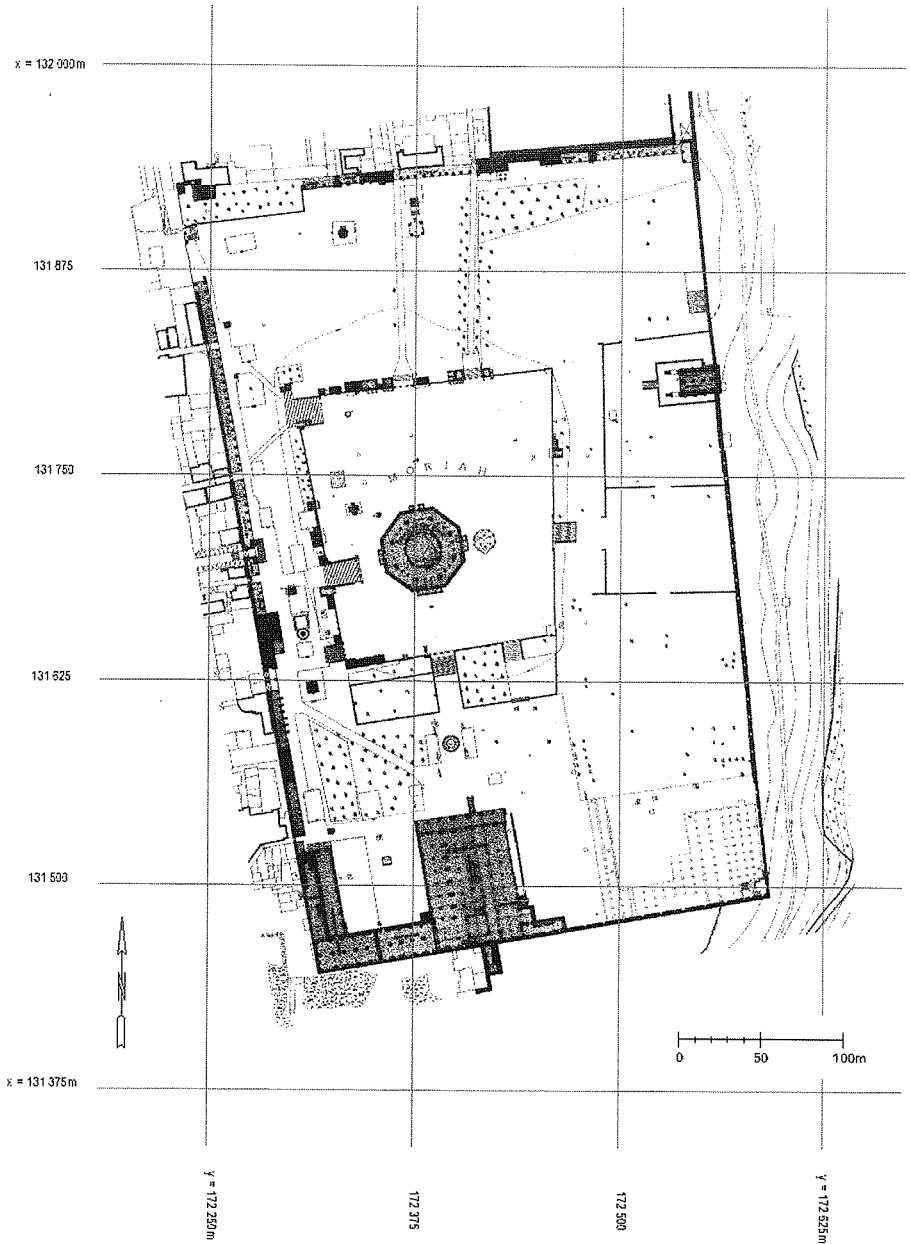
Plan of the Temple Mount platform with the existing buildings and coordinate grid. (Site plan from the Survey of Israel , cf. n. 3. AutoCad computer processing and drawing by author)
